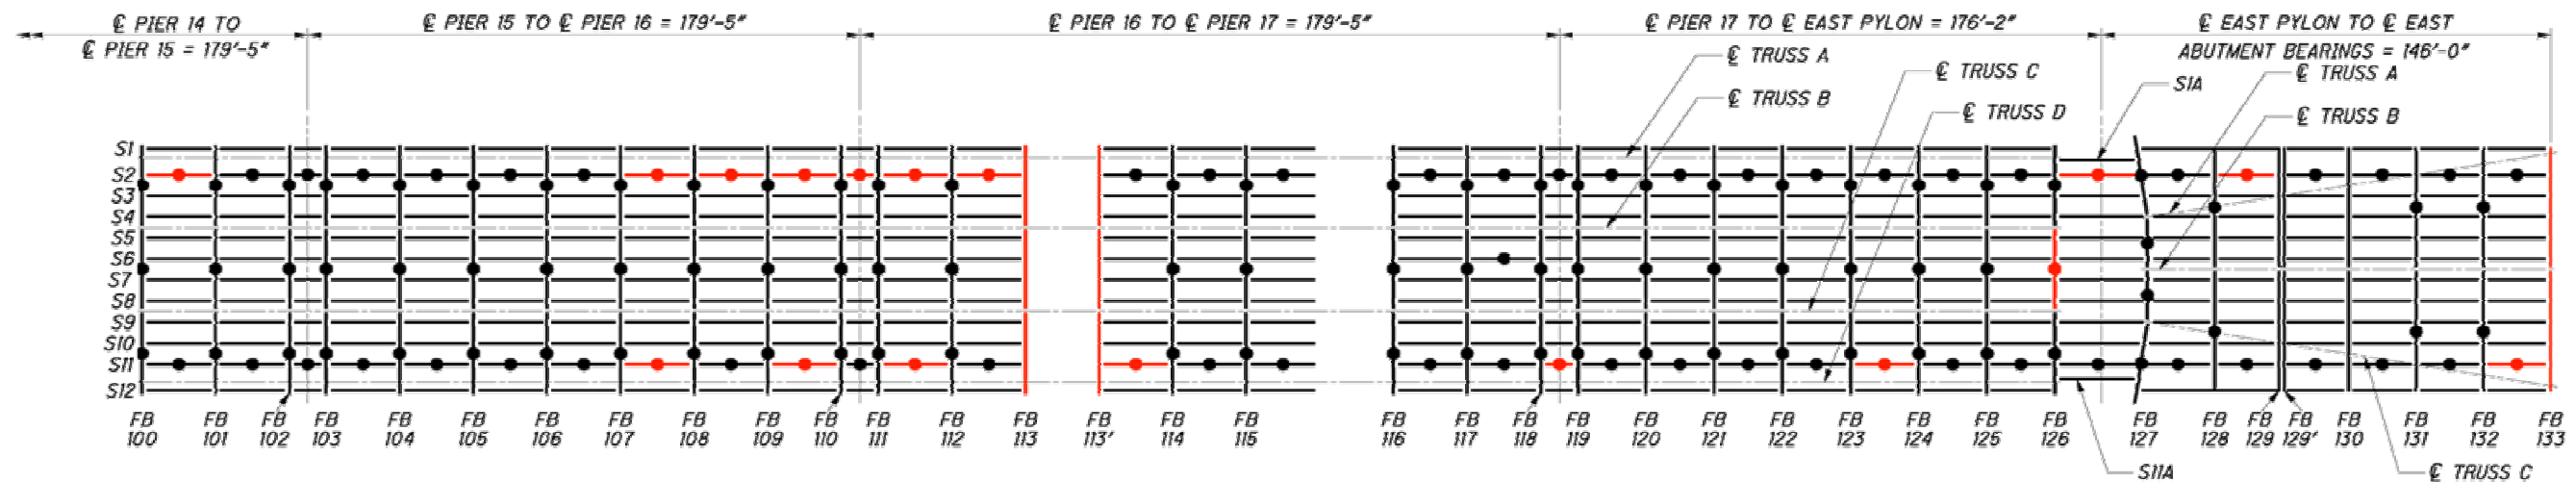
Framing Plan and Elevation of Spans 12 to 15.
